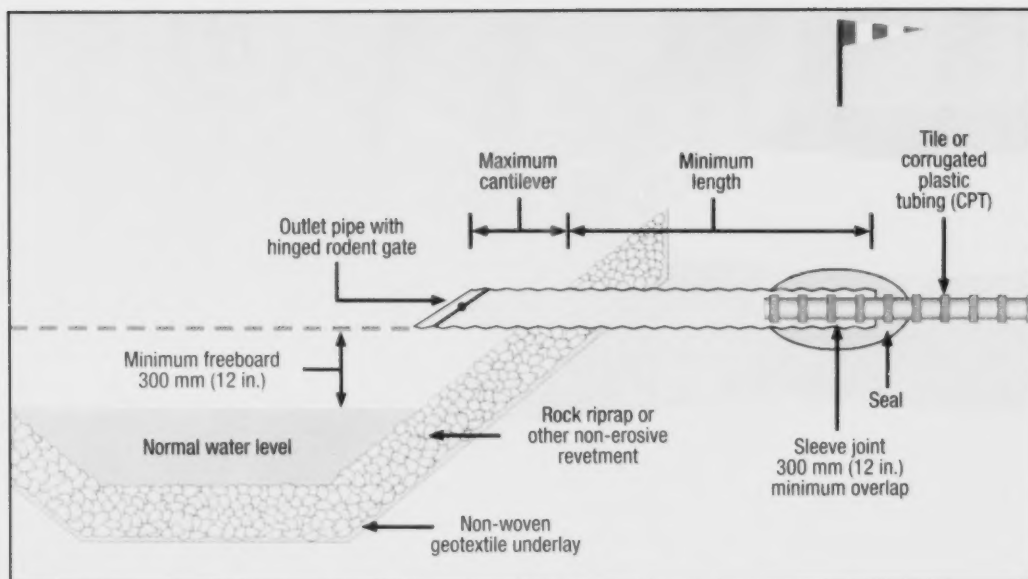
Well Constructed Tile Drain "Cantilever Type" Outfall
